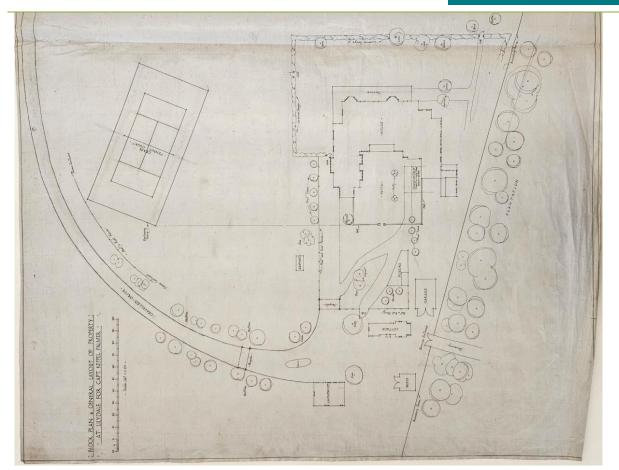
Site plan showing the main house, driveways, outbuildings, and tennis court. Source: W & R Butler & Martin Architects. n.d. *Block Plan & General Layout of Property at Lilydale for Capt. Keppel Palmer.* Architectural drawings. Marcus W. Martin collection. Accession No.: LTAD178. State Library of Victoria.
